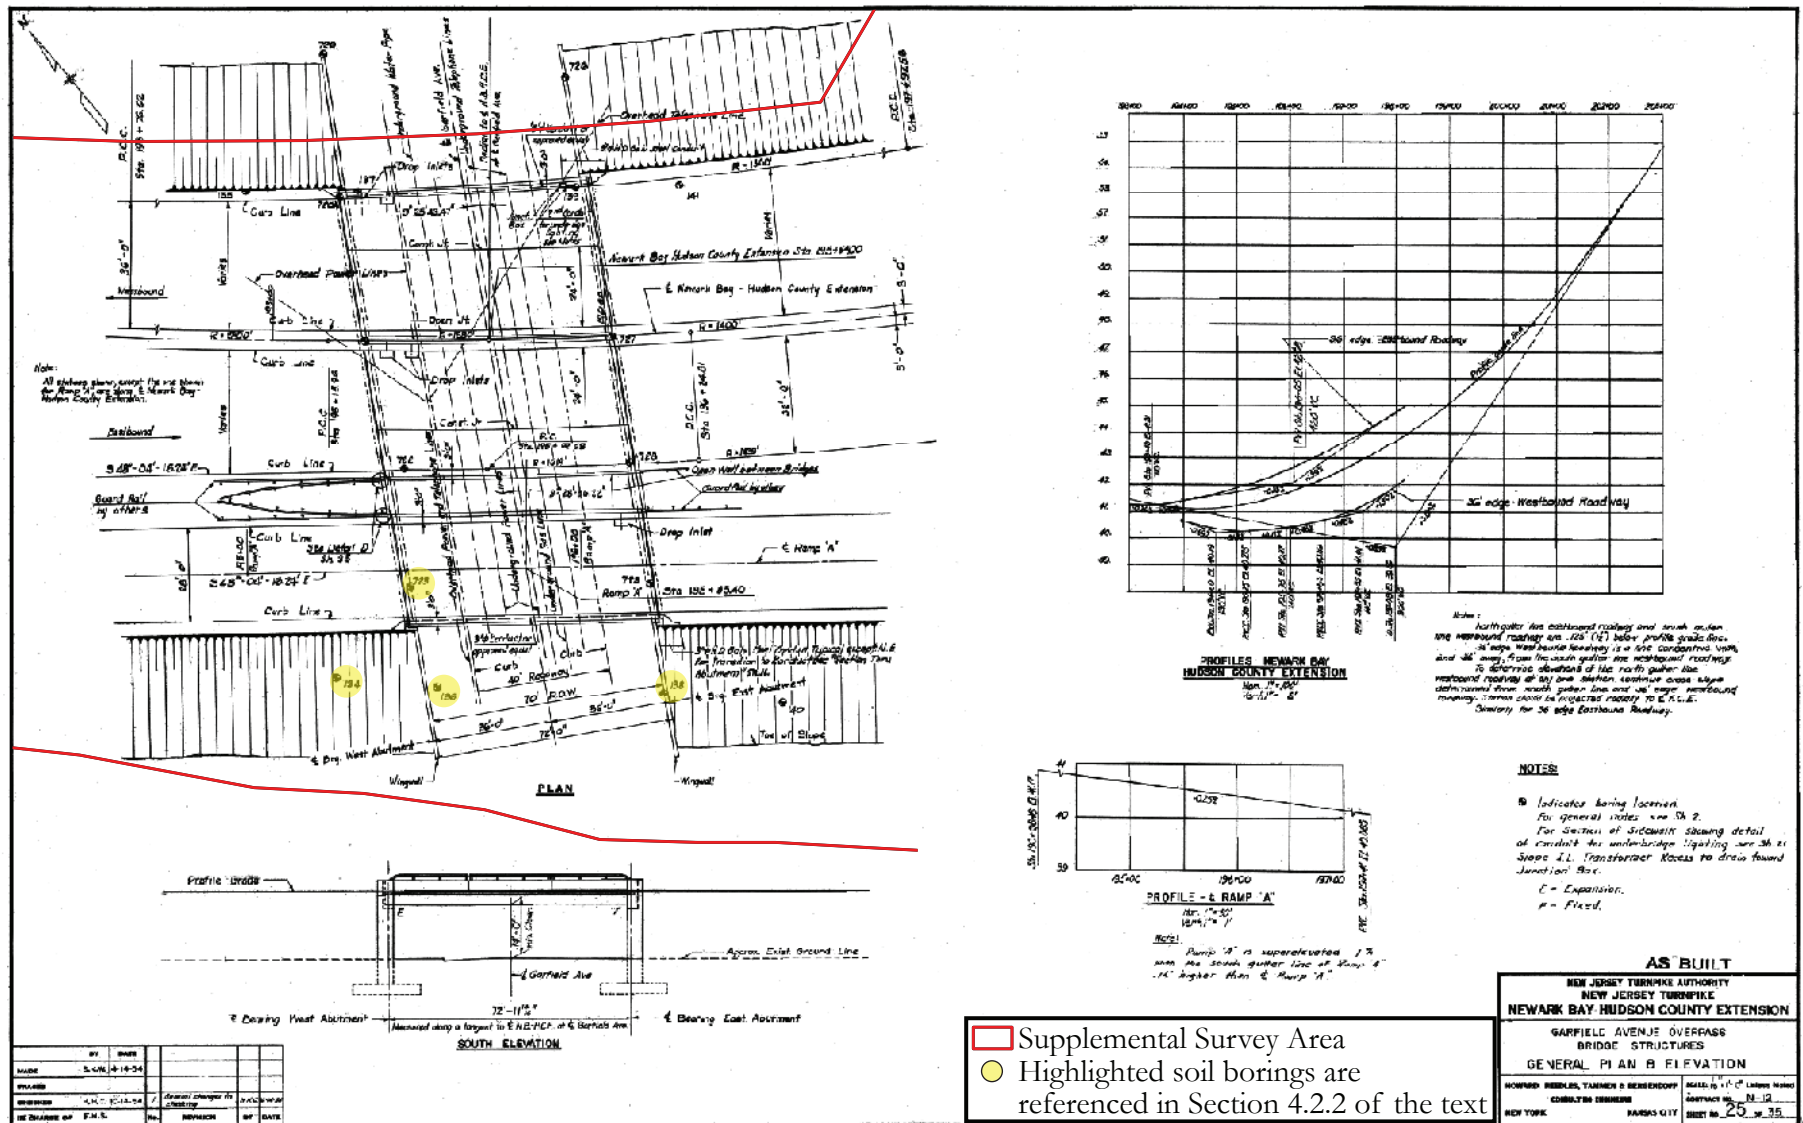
Garfield Avenue Overpass Bridge Structures, General Plan and Elevation, showing soil boring locations (Howard, Needles, Tammen and Bergendoff 1954b).
